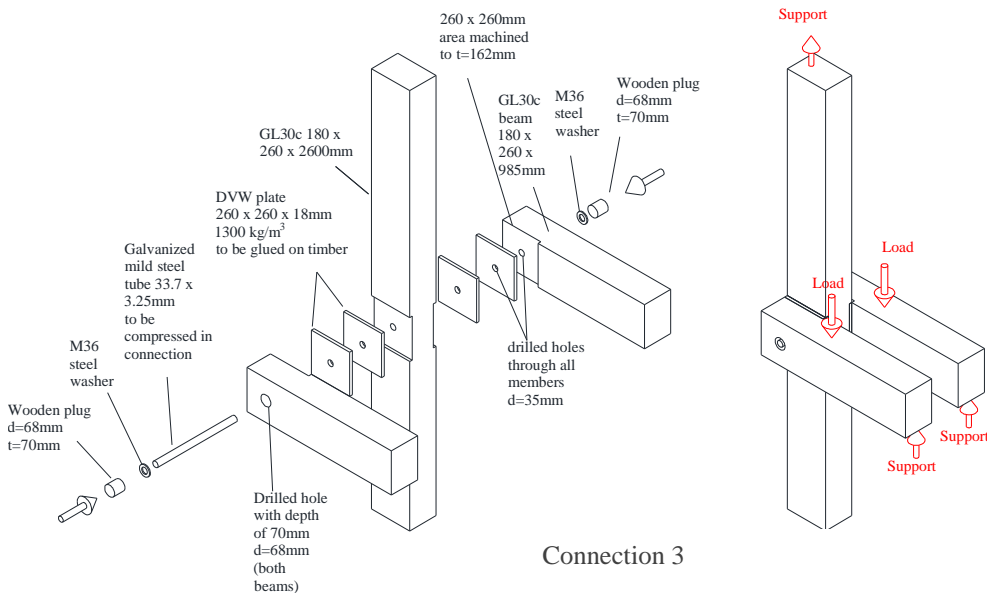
Exploded view of connection 3 (left) and assembled connection 3 (right)
